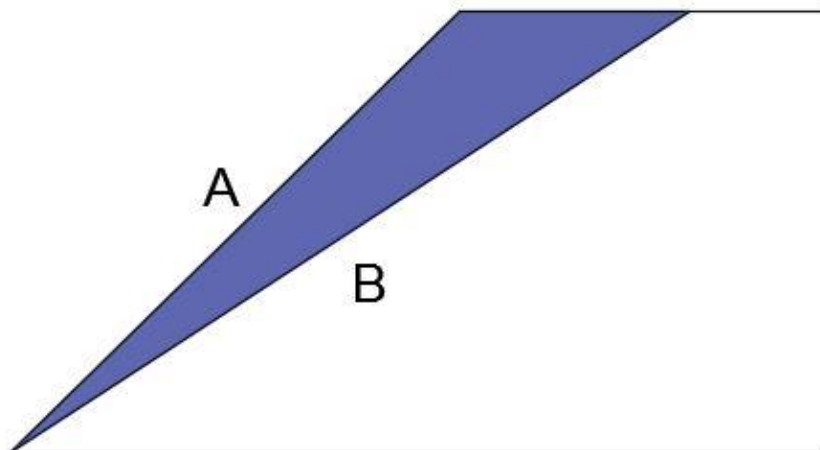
Typical view of plane failure (A = Sliding plane, B = Slope face)
